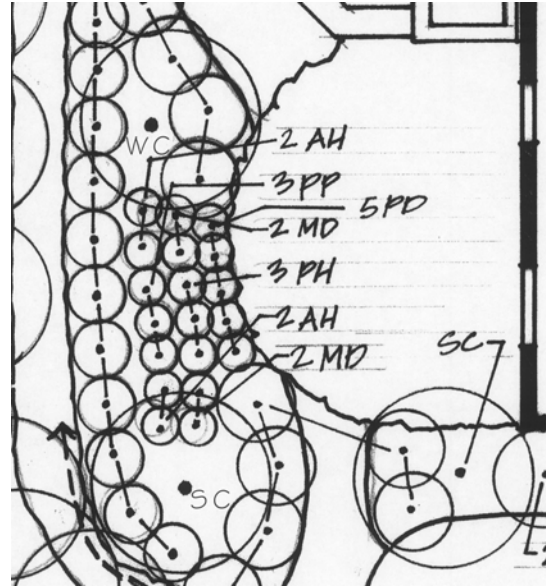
and 3.13 Sideyard rendering and planting plan for the re-design
